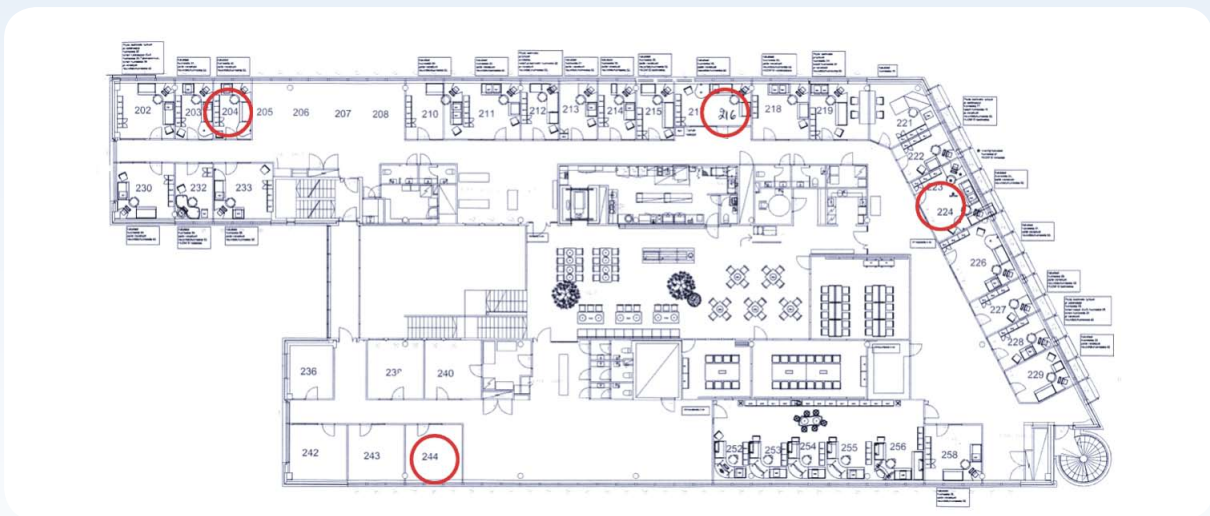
Plan view of the second floor (indoor climate measurement points are marked with red circles).
